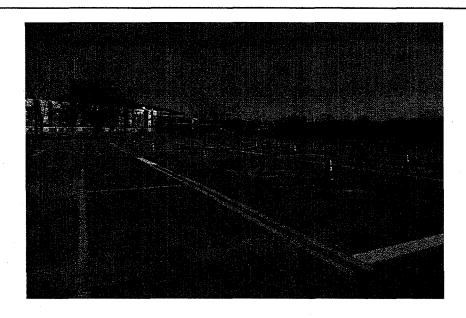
Project area, looking northeast from southwest corner of building footprint.
